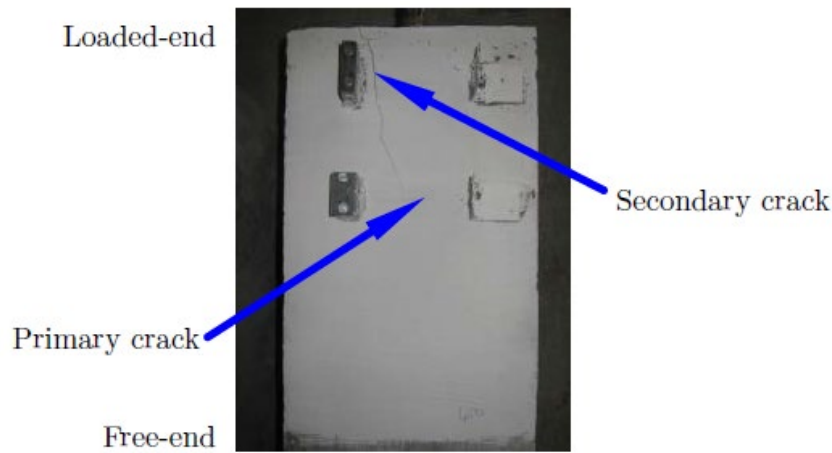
Photograph of specimen 14F-B-20-5 after testing showing the visible secondary cracks (de Villiers (2015)).
